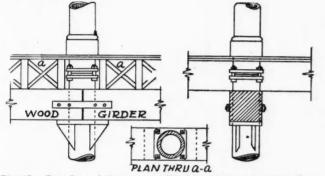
Cast Iron Columns and Timber Girders, Showing Continuous and Bolted Column
